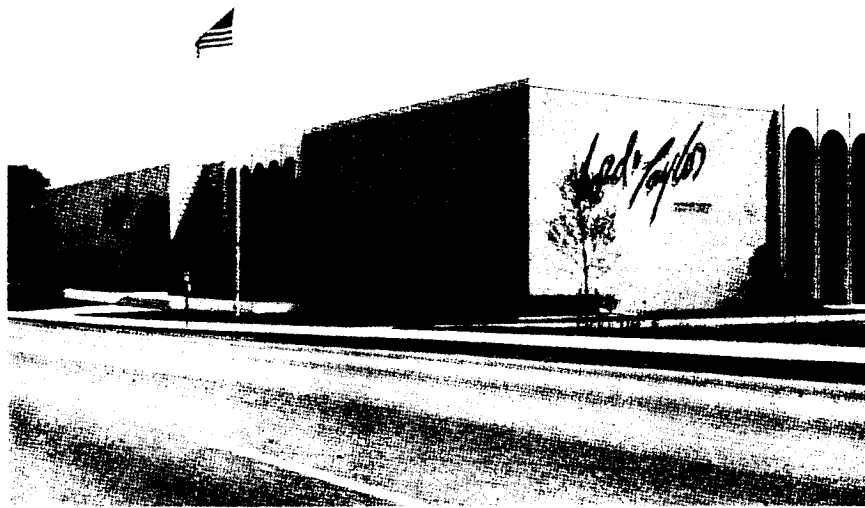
Attractive masonry construction of Lord & Taylor Department Store, Jenkintown, Pa. A 1:2:9 mortar was used.
